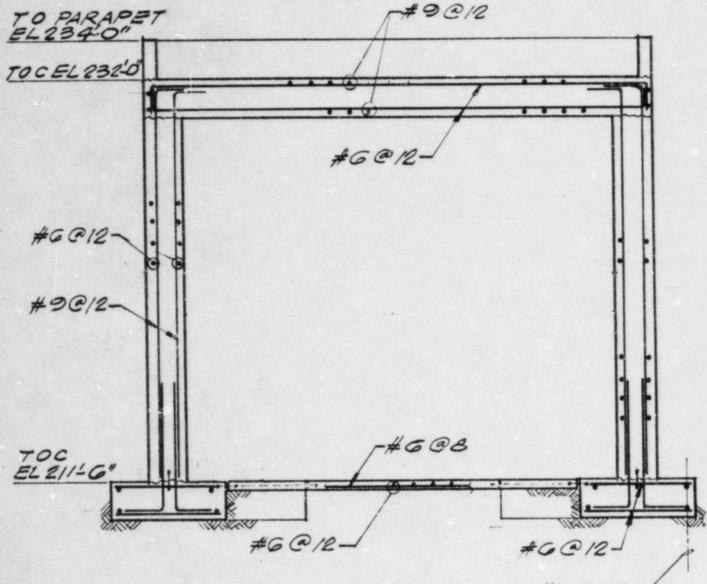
REINFORCING DETAILS (Sheet 2 of 4)
